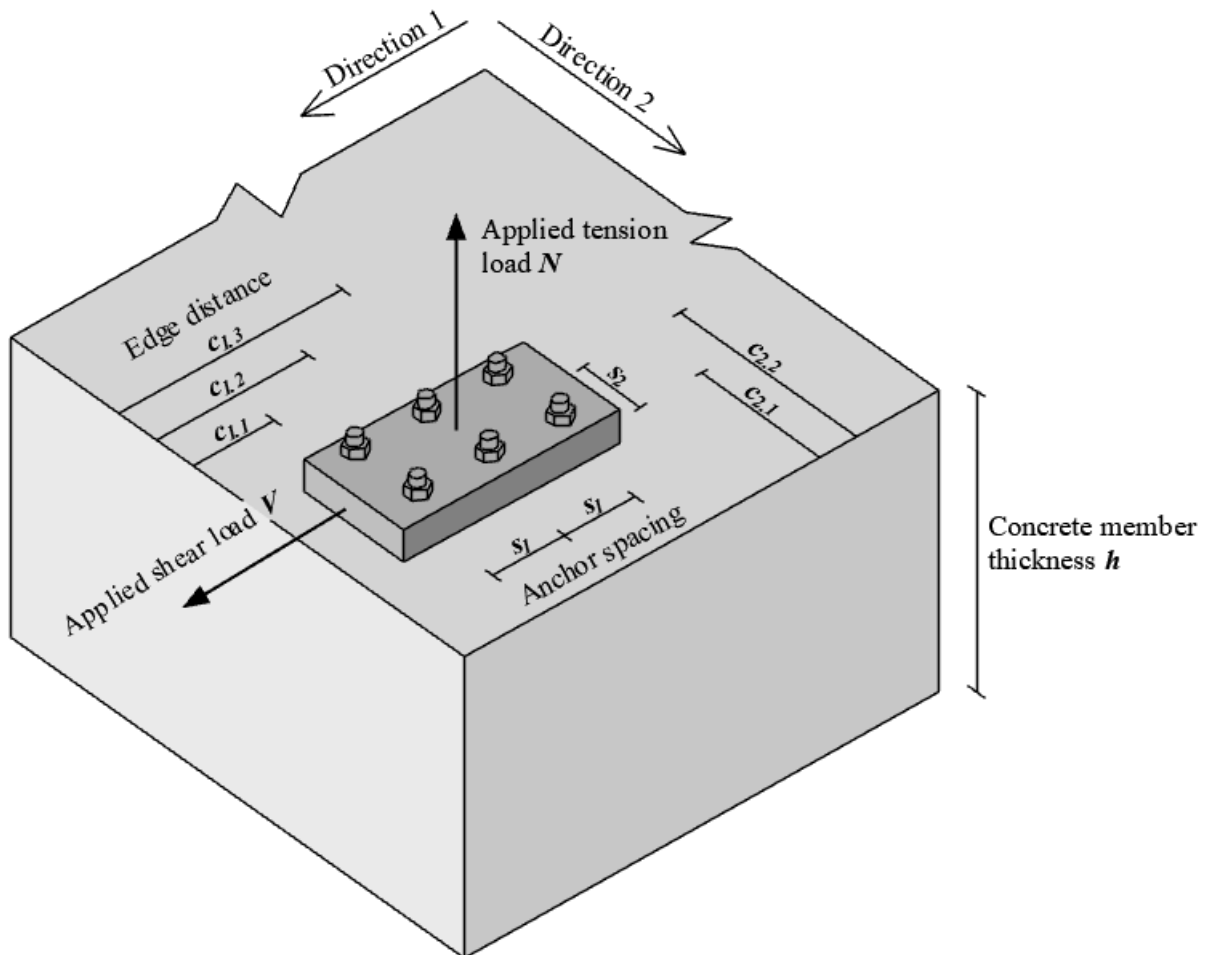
Definitions related to concrete member dimensions and loading directions
